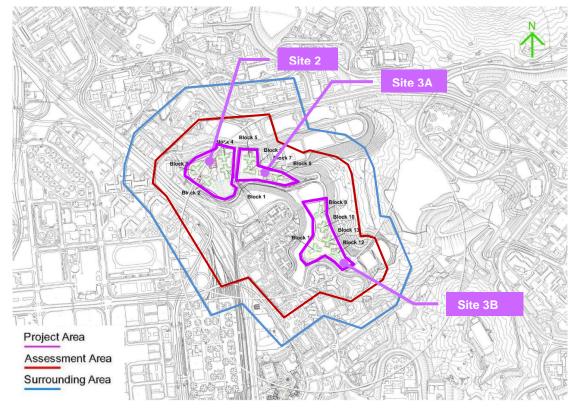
Study Area of Choi Wan Road Site 2, 3A and 3B
